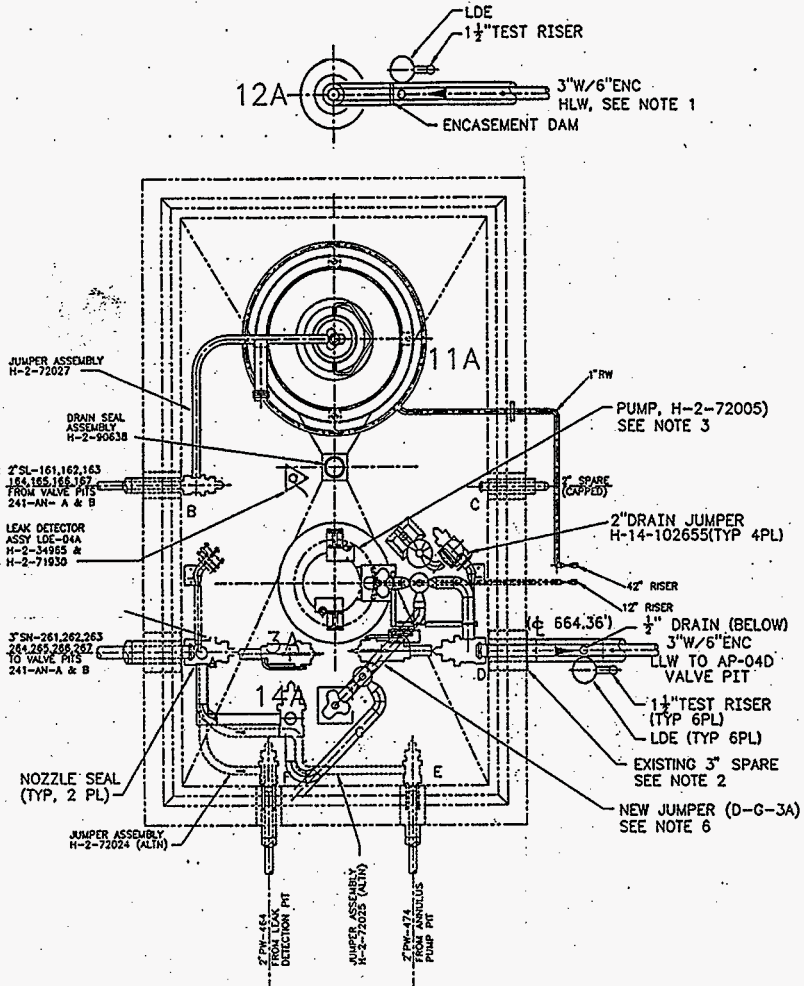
Proposed AN-01A Proposed Jumper Layout.
